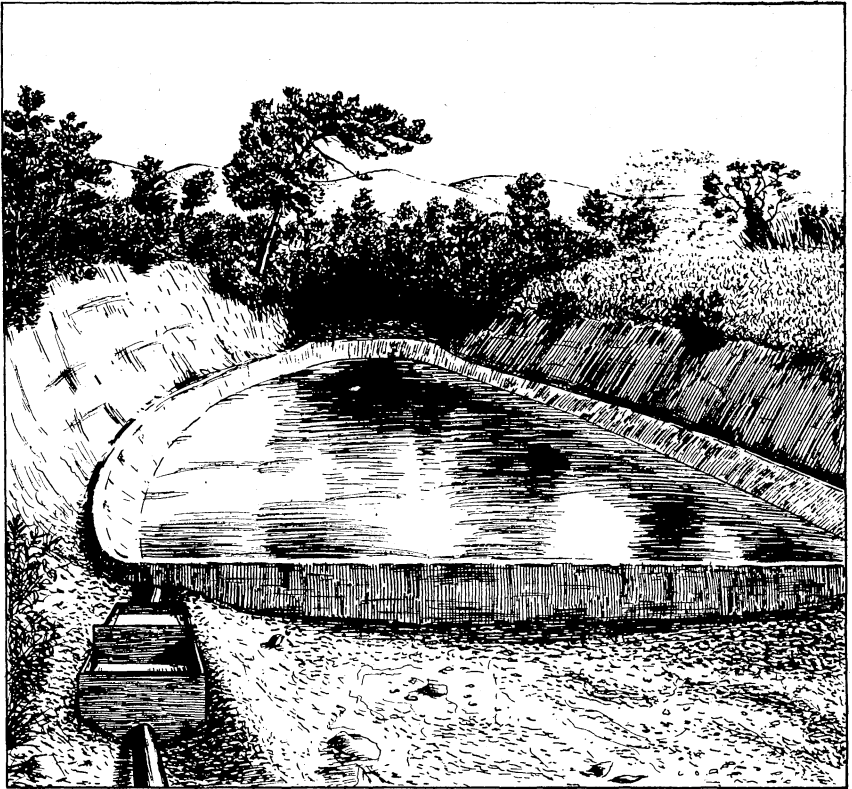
Cement reservoir for collection of water from a pumping plant, and its measuring box.
